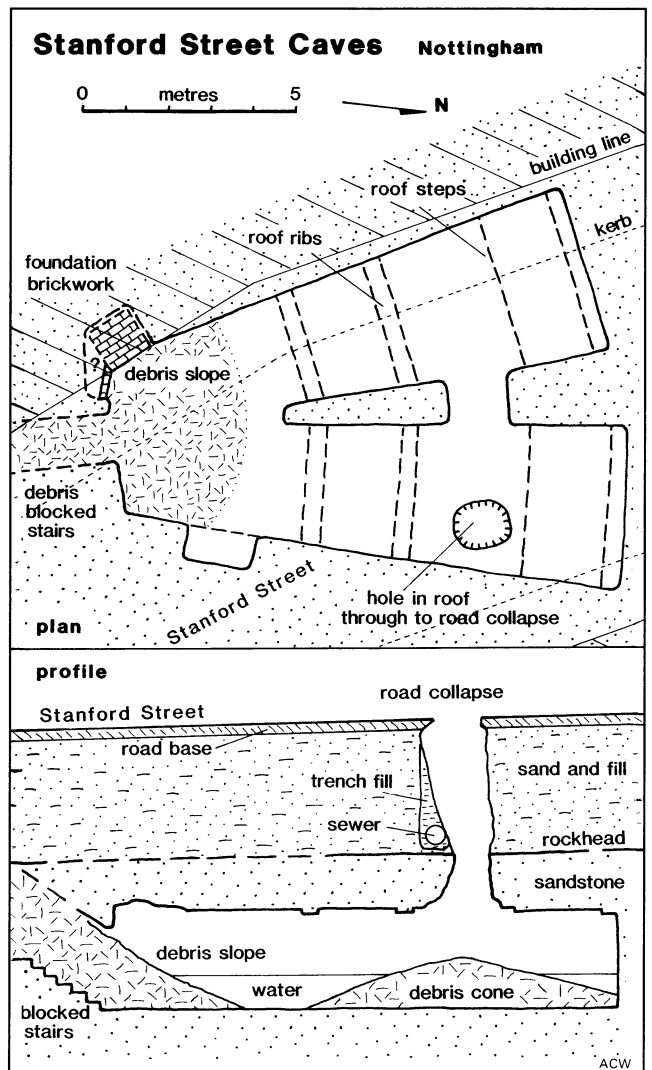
The caves beneath Stanford Street revealed by the collapse of the road in 1990 and before filling with concrete. (Survey by Tony Waltham, Ian Spibey and Jenny Walsby).
